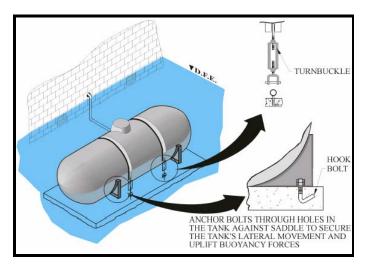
Typical anchoring arrangement for a propane tank: tie down straps over the top and a securely anchored saddle.
